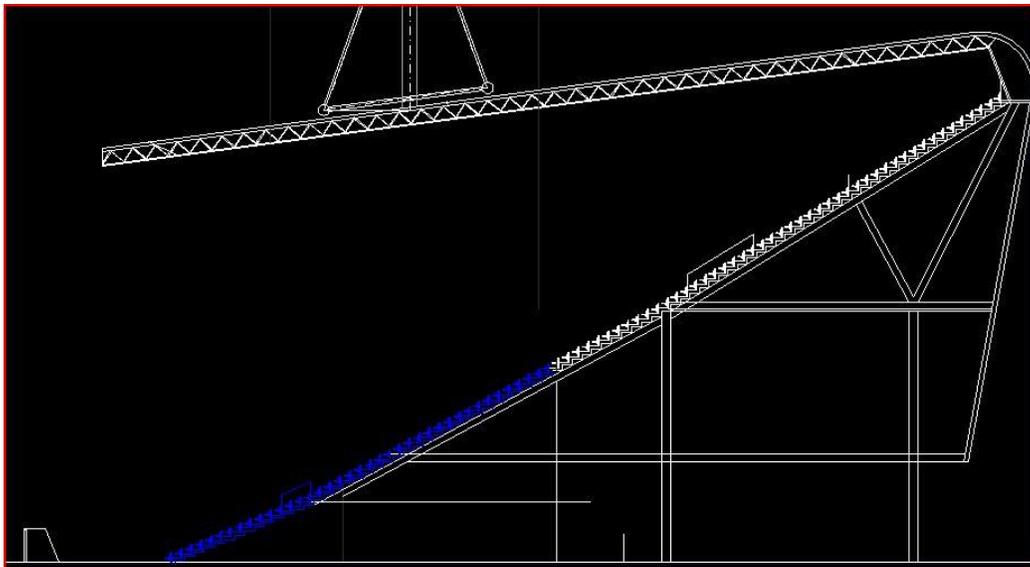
Mainstand with front roof supports removed and back-stays supporting existing segmented roof truss With Replica Leitch Gable on the centre-line.
